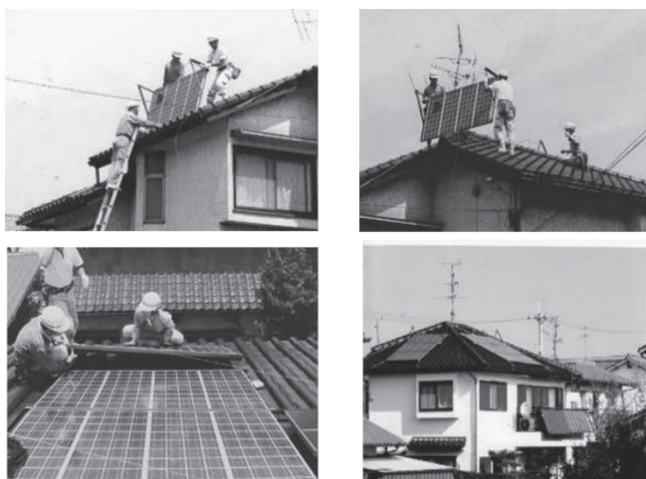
Construction progress and completed Japan's first private residential PV system. (upper left: Panels are lifted by hand, upper right: Working on the roof, lower left: Panel installation, lower right: Outlook of the completed system)
